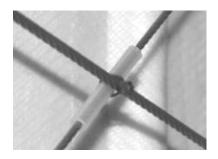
securing crossing cables, and check for incorrect fixing of lower central frame.
